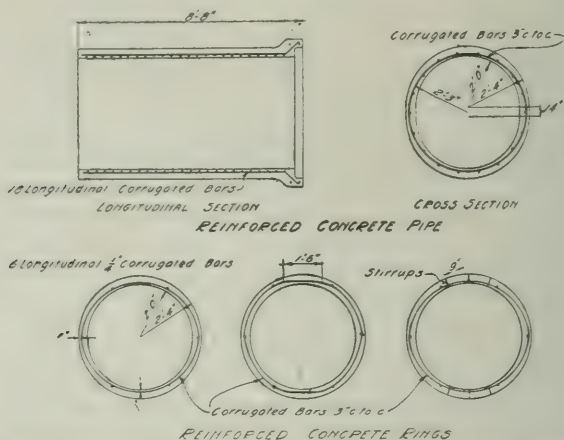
Distribution of Reinforcement in the Reinforced Concrete Pipes and Rings.
